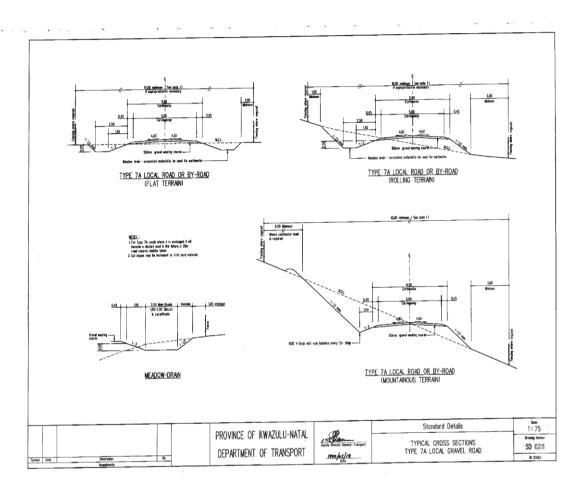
showing the type 7A local gravel road (Drawing no. SD0211)
